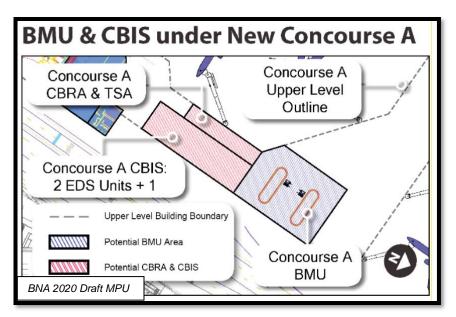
Baggage Makeup and Checked Baggage Inspection System Layout
